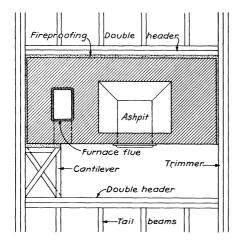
Installation of floor framing around a chimney and hearth. Where a header is more than 4 feet long, it should be doubled as shown. If it supports more than four tail beams, its ends should be supported in metal joists hangers. The framing may be placed one-half inch from masonry chimney walls 8 inches thick.
